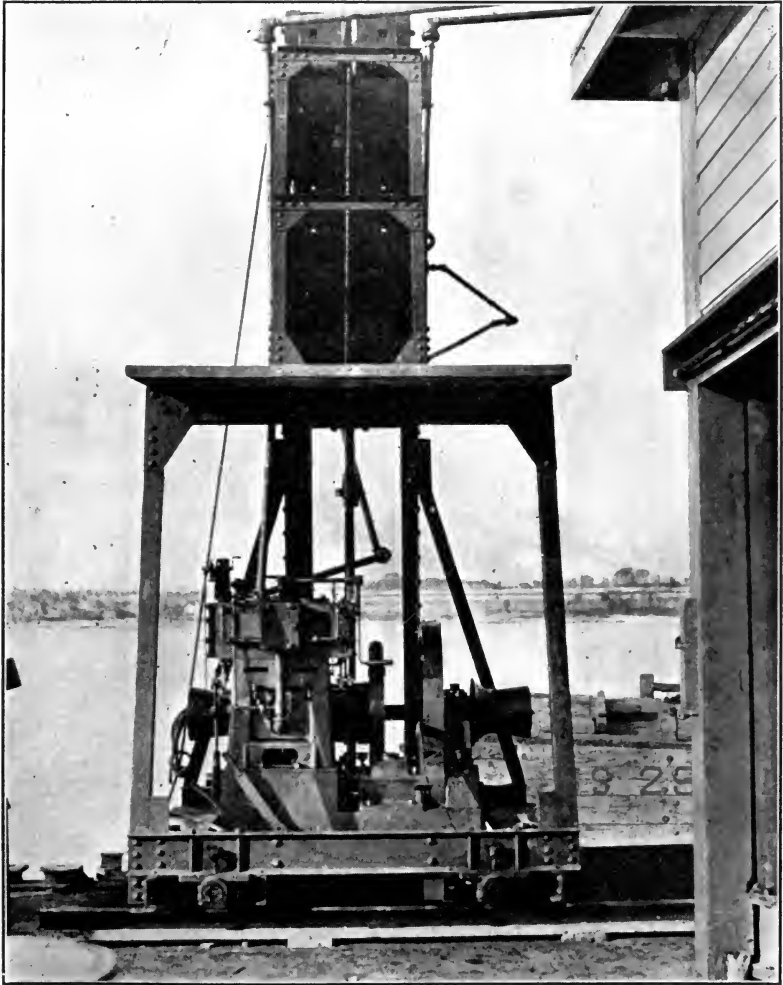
Rear view of drill frame and engine. (Courtesy of Ingersoll-Rand Co.)
